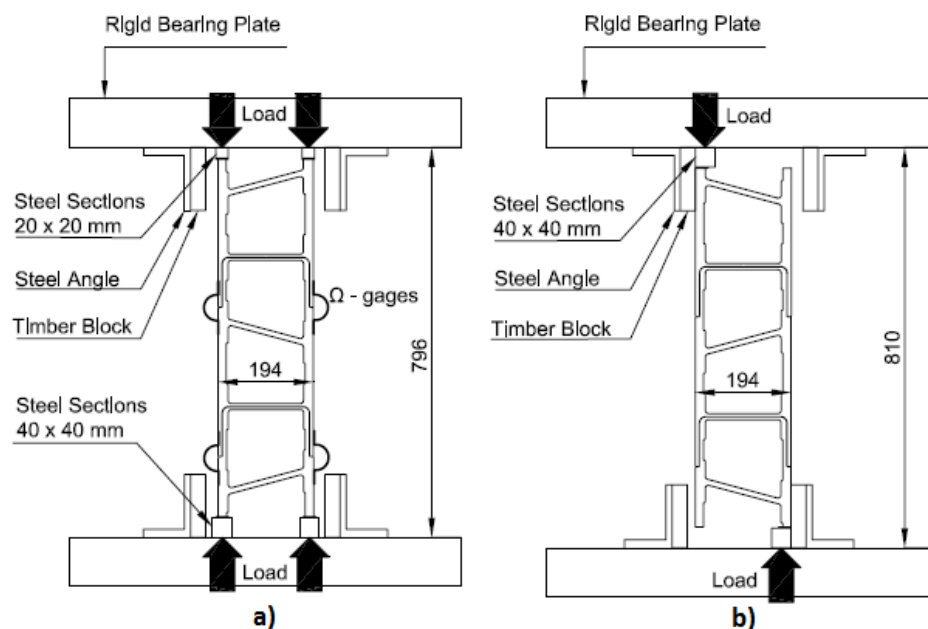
Experimental set-up for a) in-plane compression; b) in-plane shear (Keller & Gürtler, 2006)
